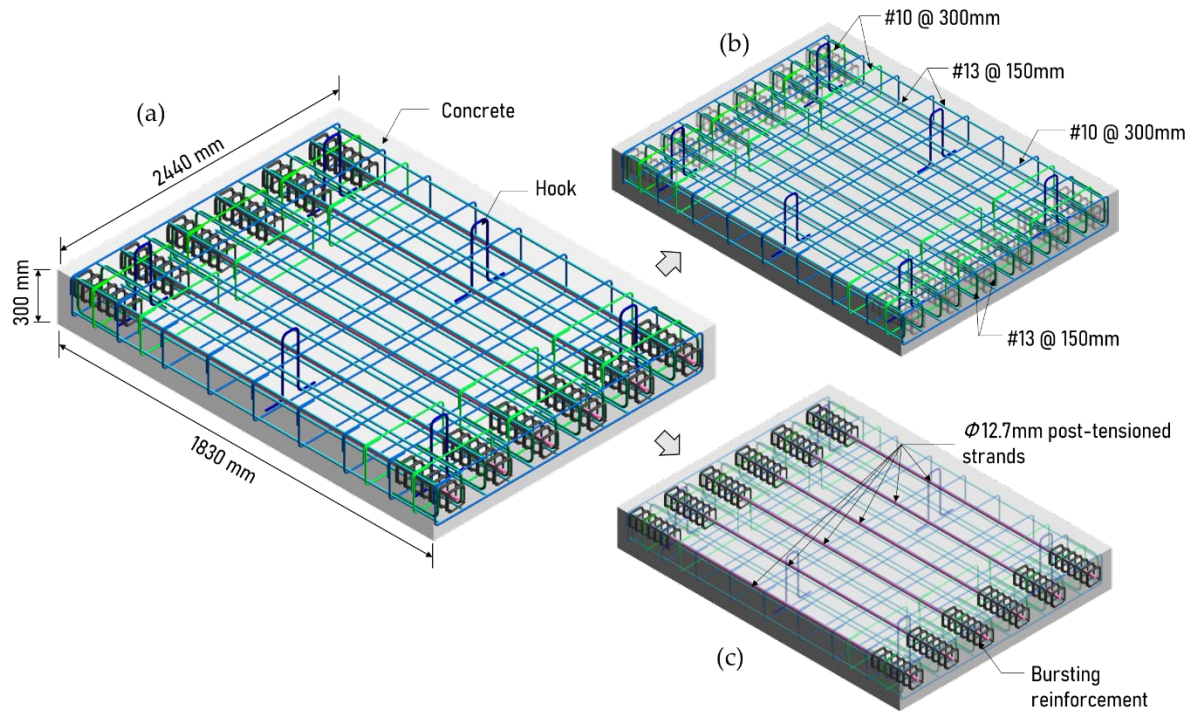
(a) Dimension, (b) reinforcement, and (c) unbonded prestressing details of TS 4
